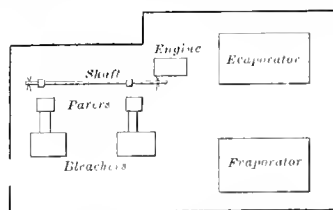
FLOOR ARRANGEMENT OF MR. PERRIGO'S EVAPORATING BUILDING.
